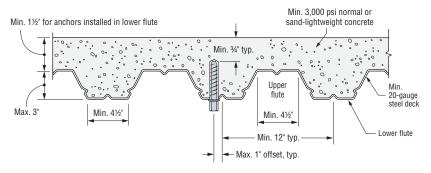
THD50234RH Installation in Concrete over Metal Deck
